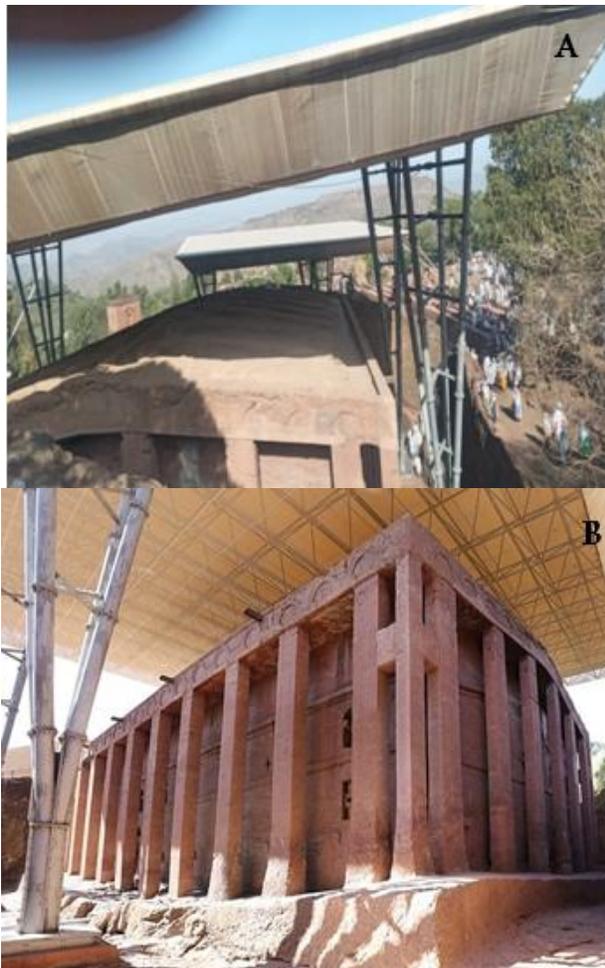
The Roof (a) and Installed Shelter (b) of Bete-Medhane-Alem – church -Source: Author December (2020)
